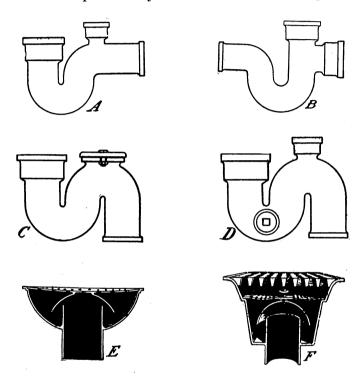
Types of traps for drainage in abattoirs. A, "P" trap with vent; B, running trap with vent; C, "S" trap with hand hole and cover; D, "S" trap with vent and brass trap screw on side; E, section of bell trap; F, section of cesspool bell trap.
